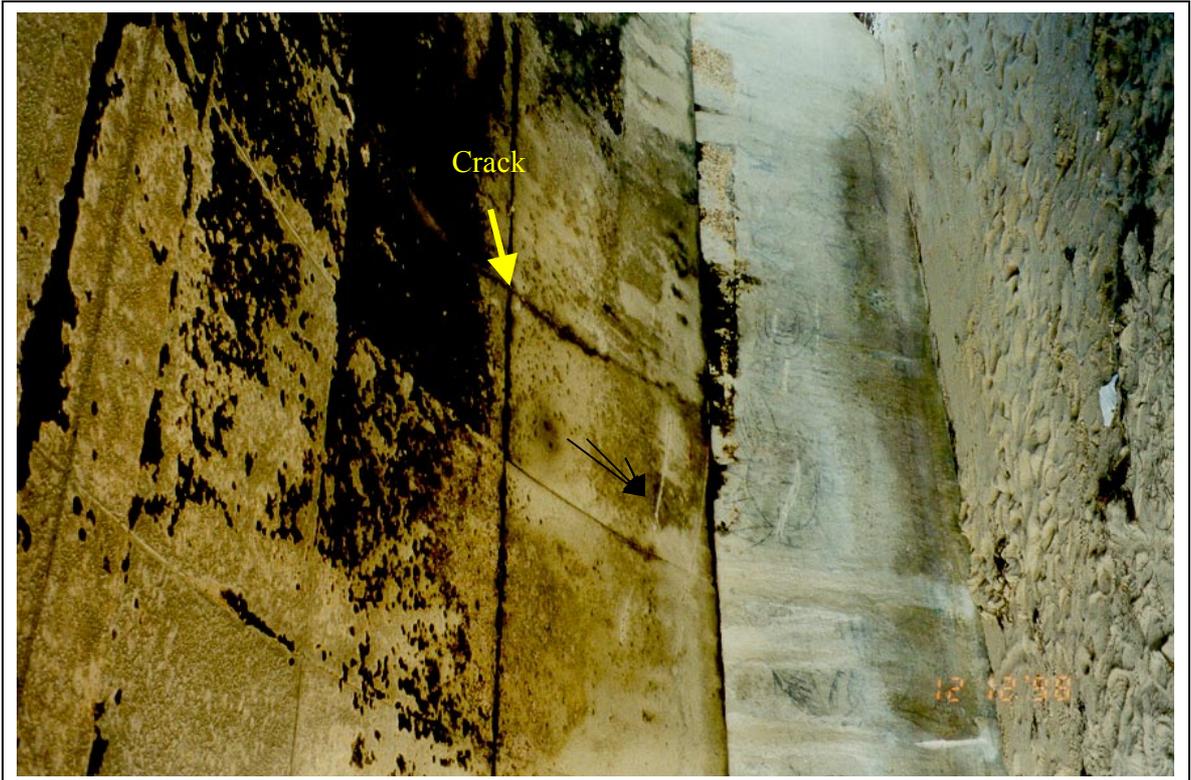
Longitudinal crack in the soffit of the arch
